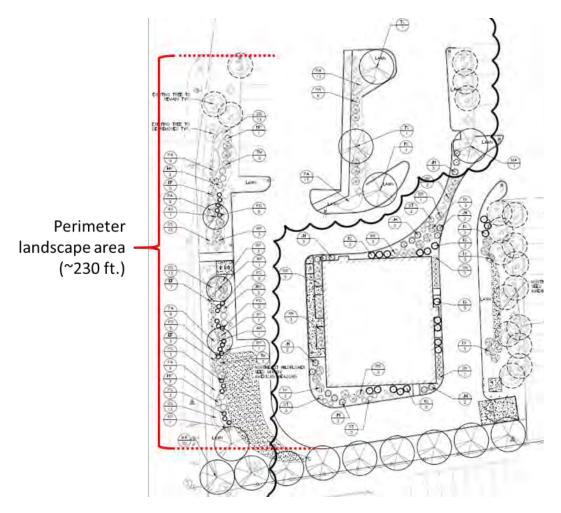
Image of the proposed Landscaping Plan with the perimenter landscape area indicated in red.
